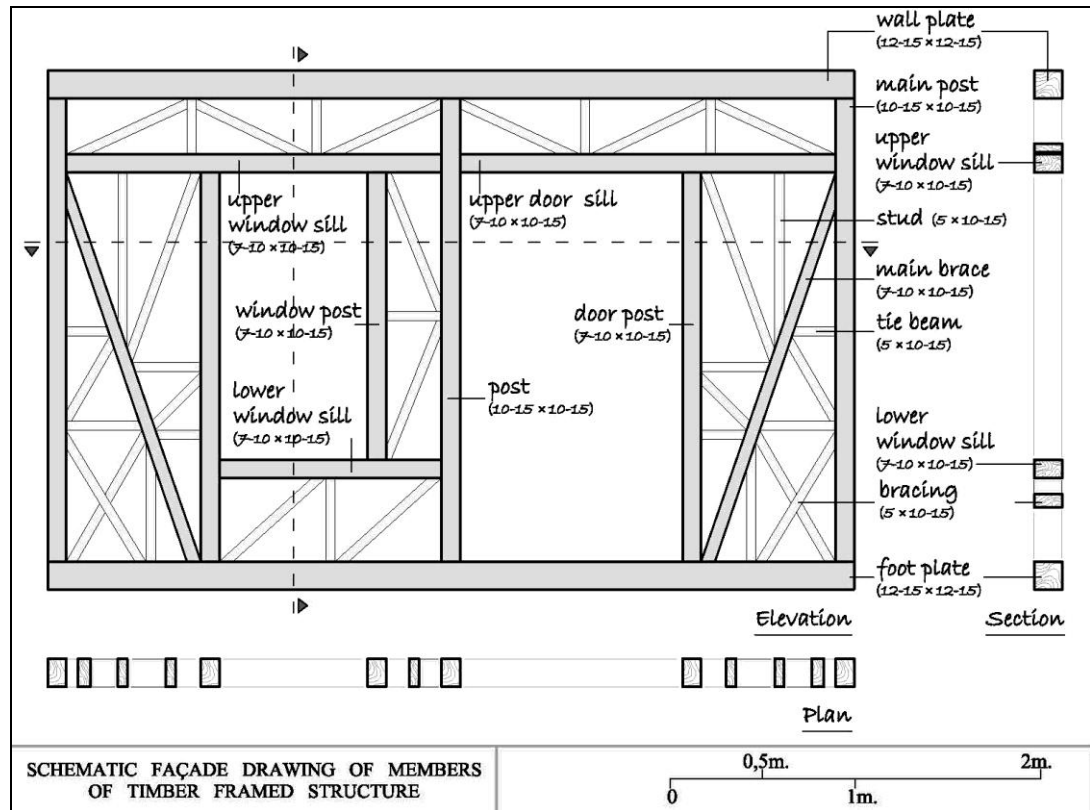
, Schematic façade drawings of load-bearing elements of timber framed structure of a room
